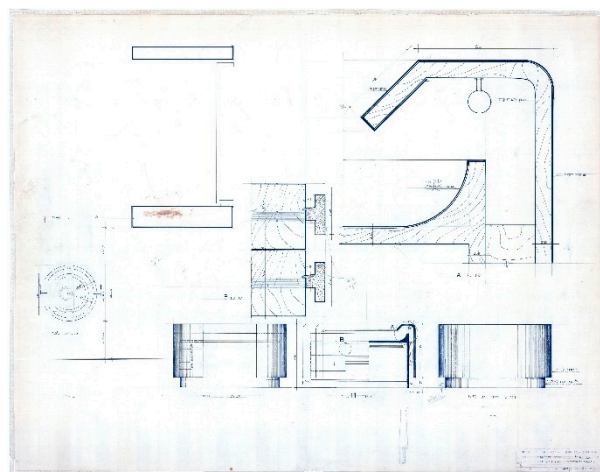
Arie and Eldar Sharon, Beit America-Israel: information desk: plan, sections and elevations, 1:20/1:10/1:1, 24.9.70.
